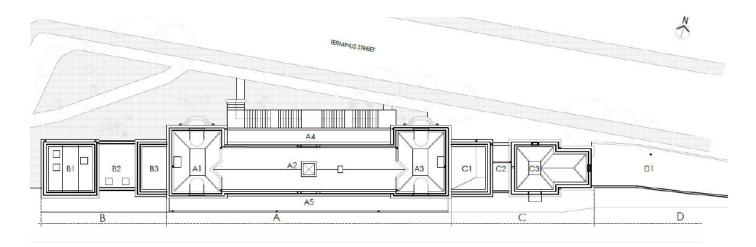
Existing roof plan of Former Station Building (OCP Architects, 2023)
